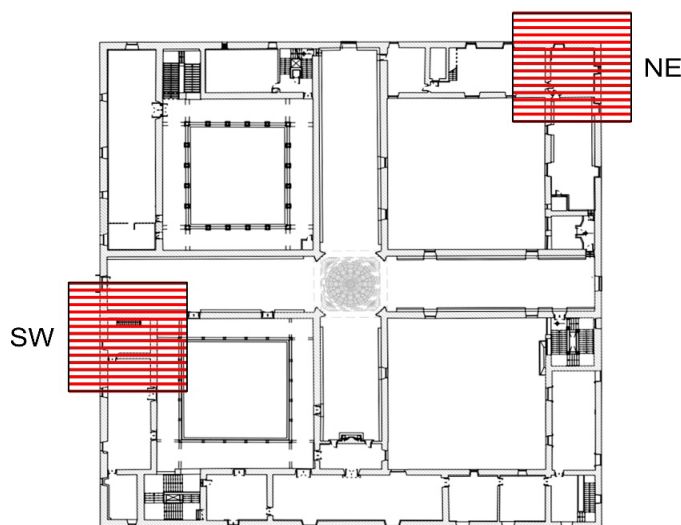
Location by facades of the rooms in the building. Room 1= NE and Room 2= SW.
